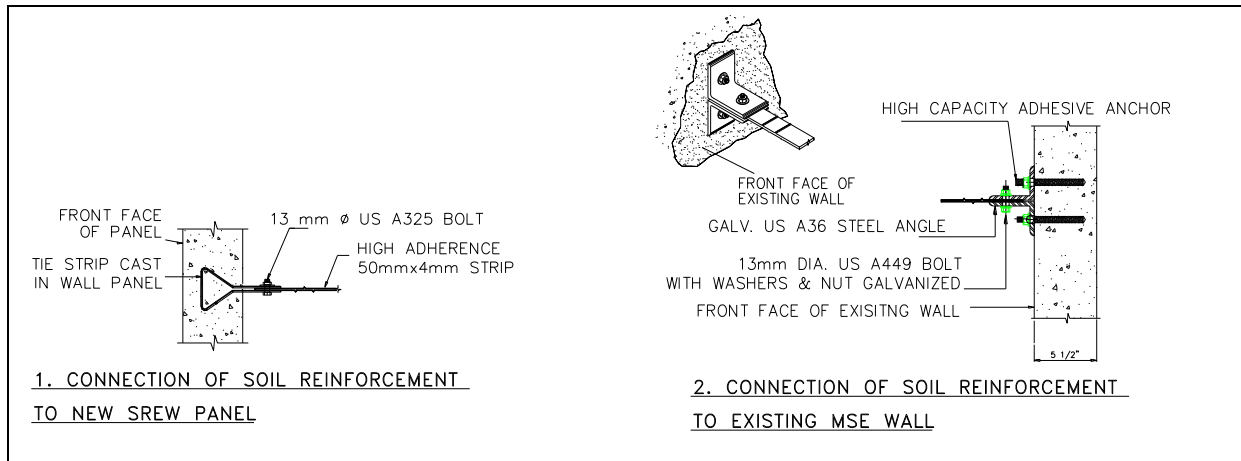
left to right : 1) connection of steel strips to facing of SREW; 2) connection of strips to facing of existing MSE wall
